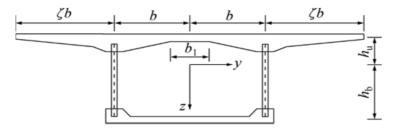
Sectional view of the PC box girder with corrugated steel webs
